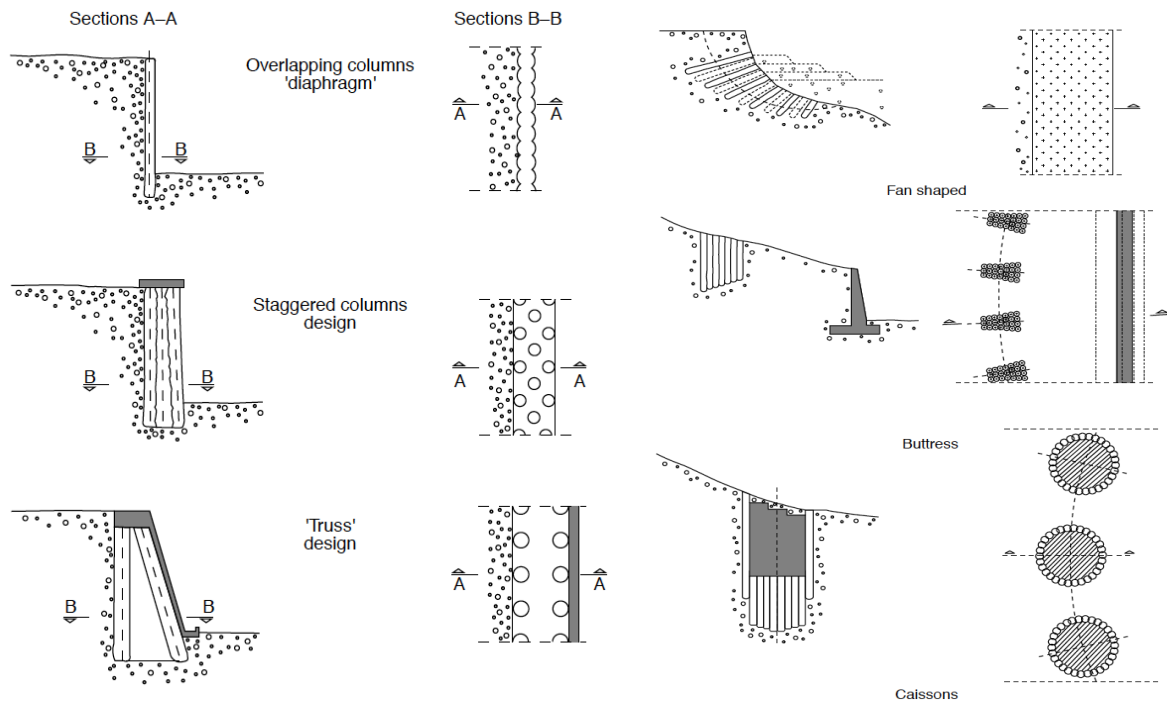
Typical applications of grouting for earth retaining structures (Left) and slope stabilization (Right) (Lunardi 1997).
